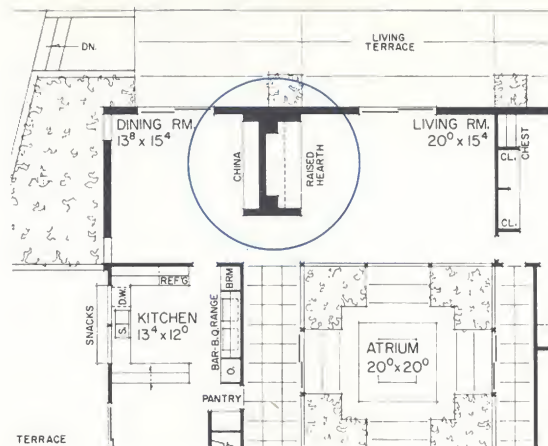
B Separation by fireplace and atrium. (Home Planners, Inc.)
